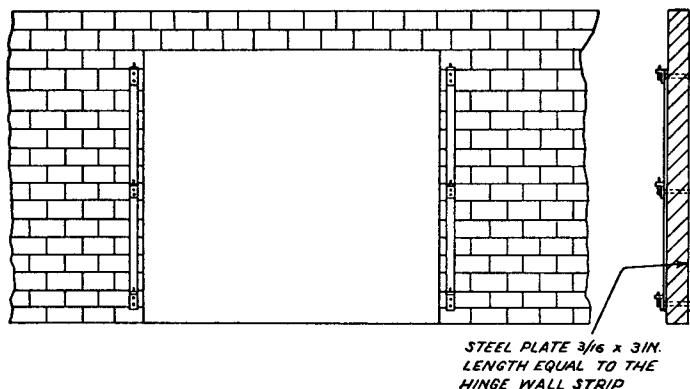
Concrete block wall prepared for doors swinging in pairs — lap mounted.
